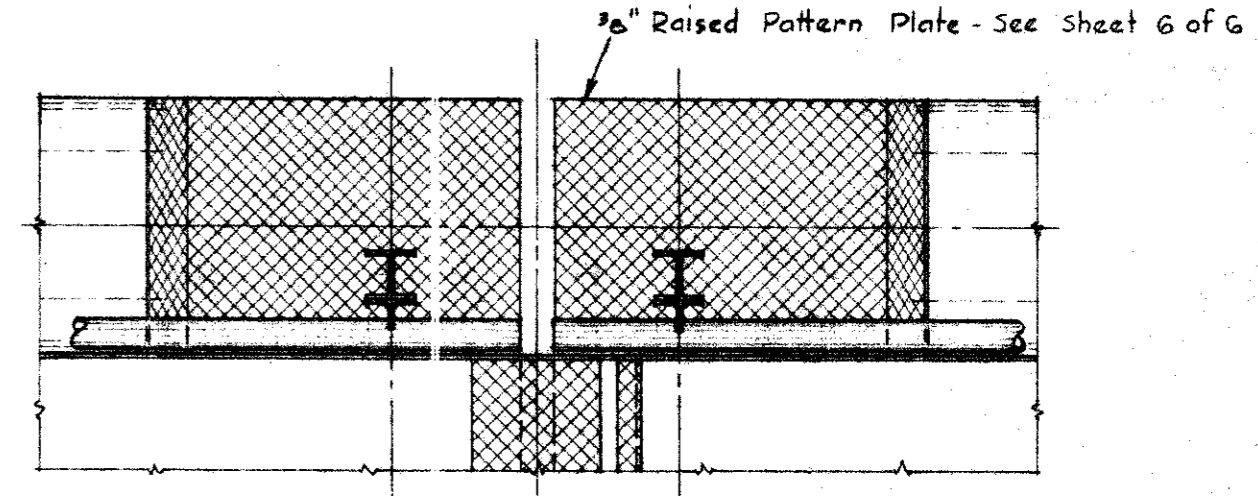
DETAILS OF ARCH RIB AT TOP PIN - HINGE SPlice
